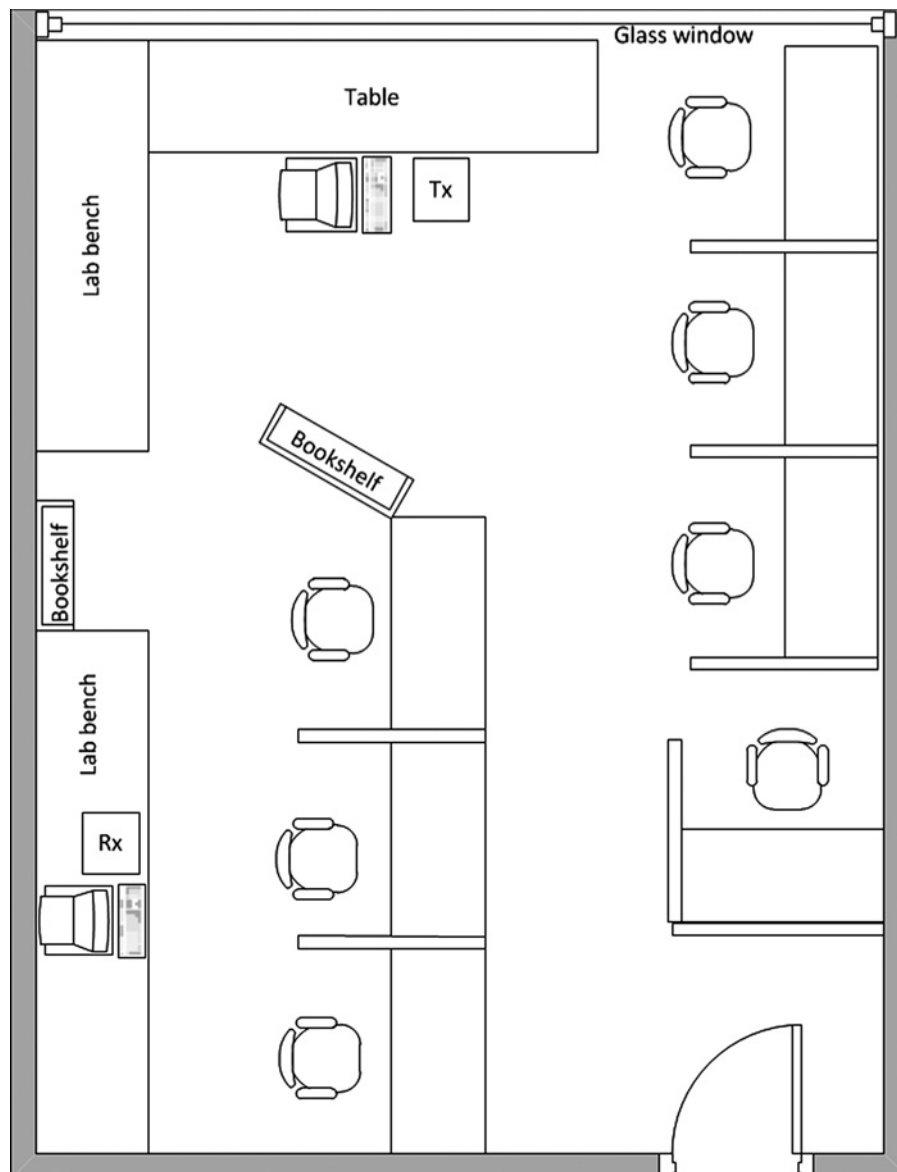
Floor plan of the indoor NLOS environment (9.1 m × 7.0 m)
